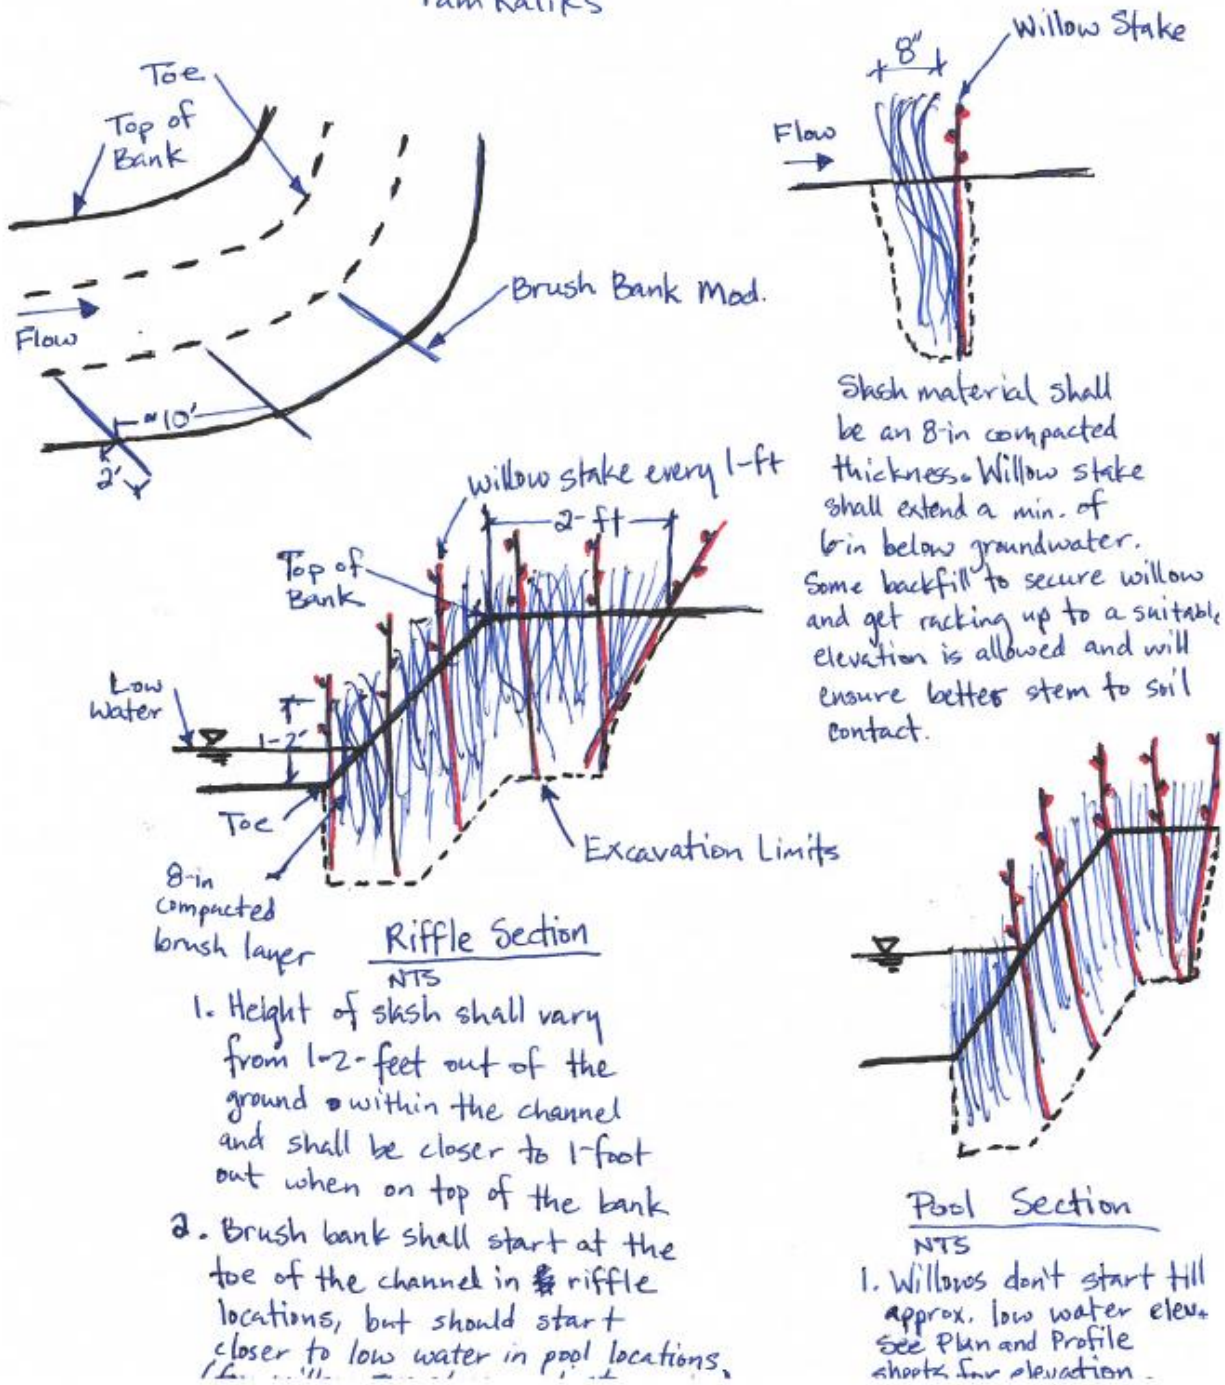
Jeff's detailed description of willow trenches that will be used to replace 84' brush bank treatment between ~Station 10+25 to 10+75.
